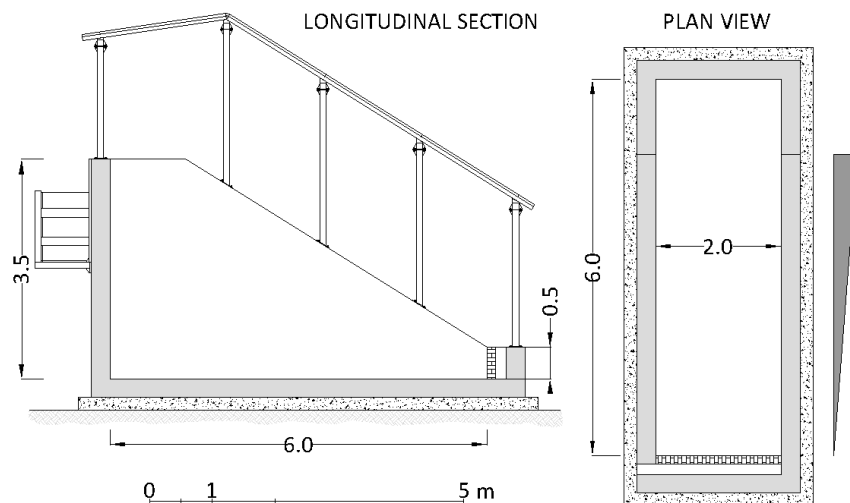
Longitudinal section and plan view of the large-scale artificial slope
